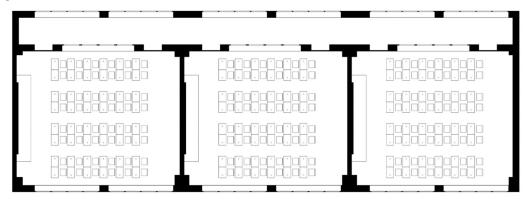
Classroom Layout Plan and Sampling Point Location Diagram
